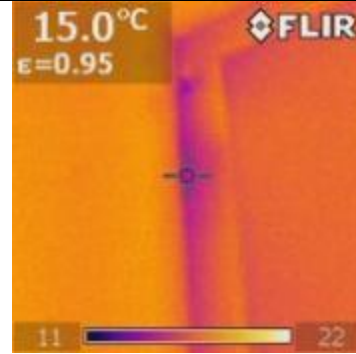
a. Kitchen. Leak between balcony door and door frame.
